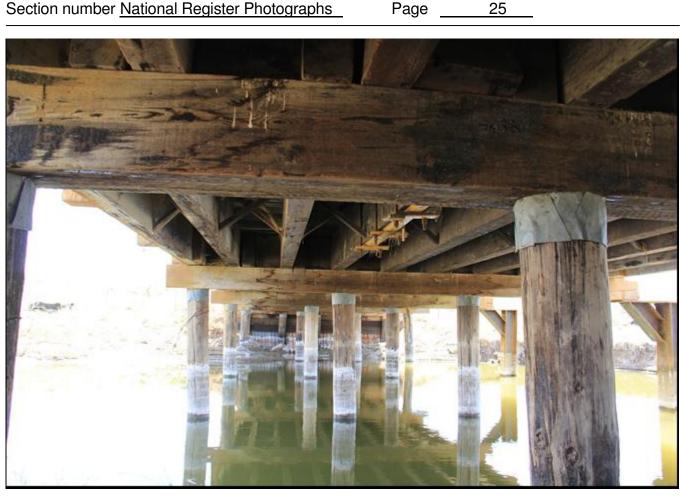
Cottonwood Creek Bridge. Detail of underside of deck. View to the south.
